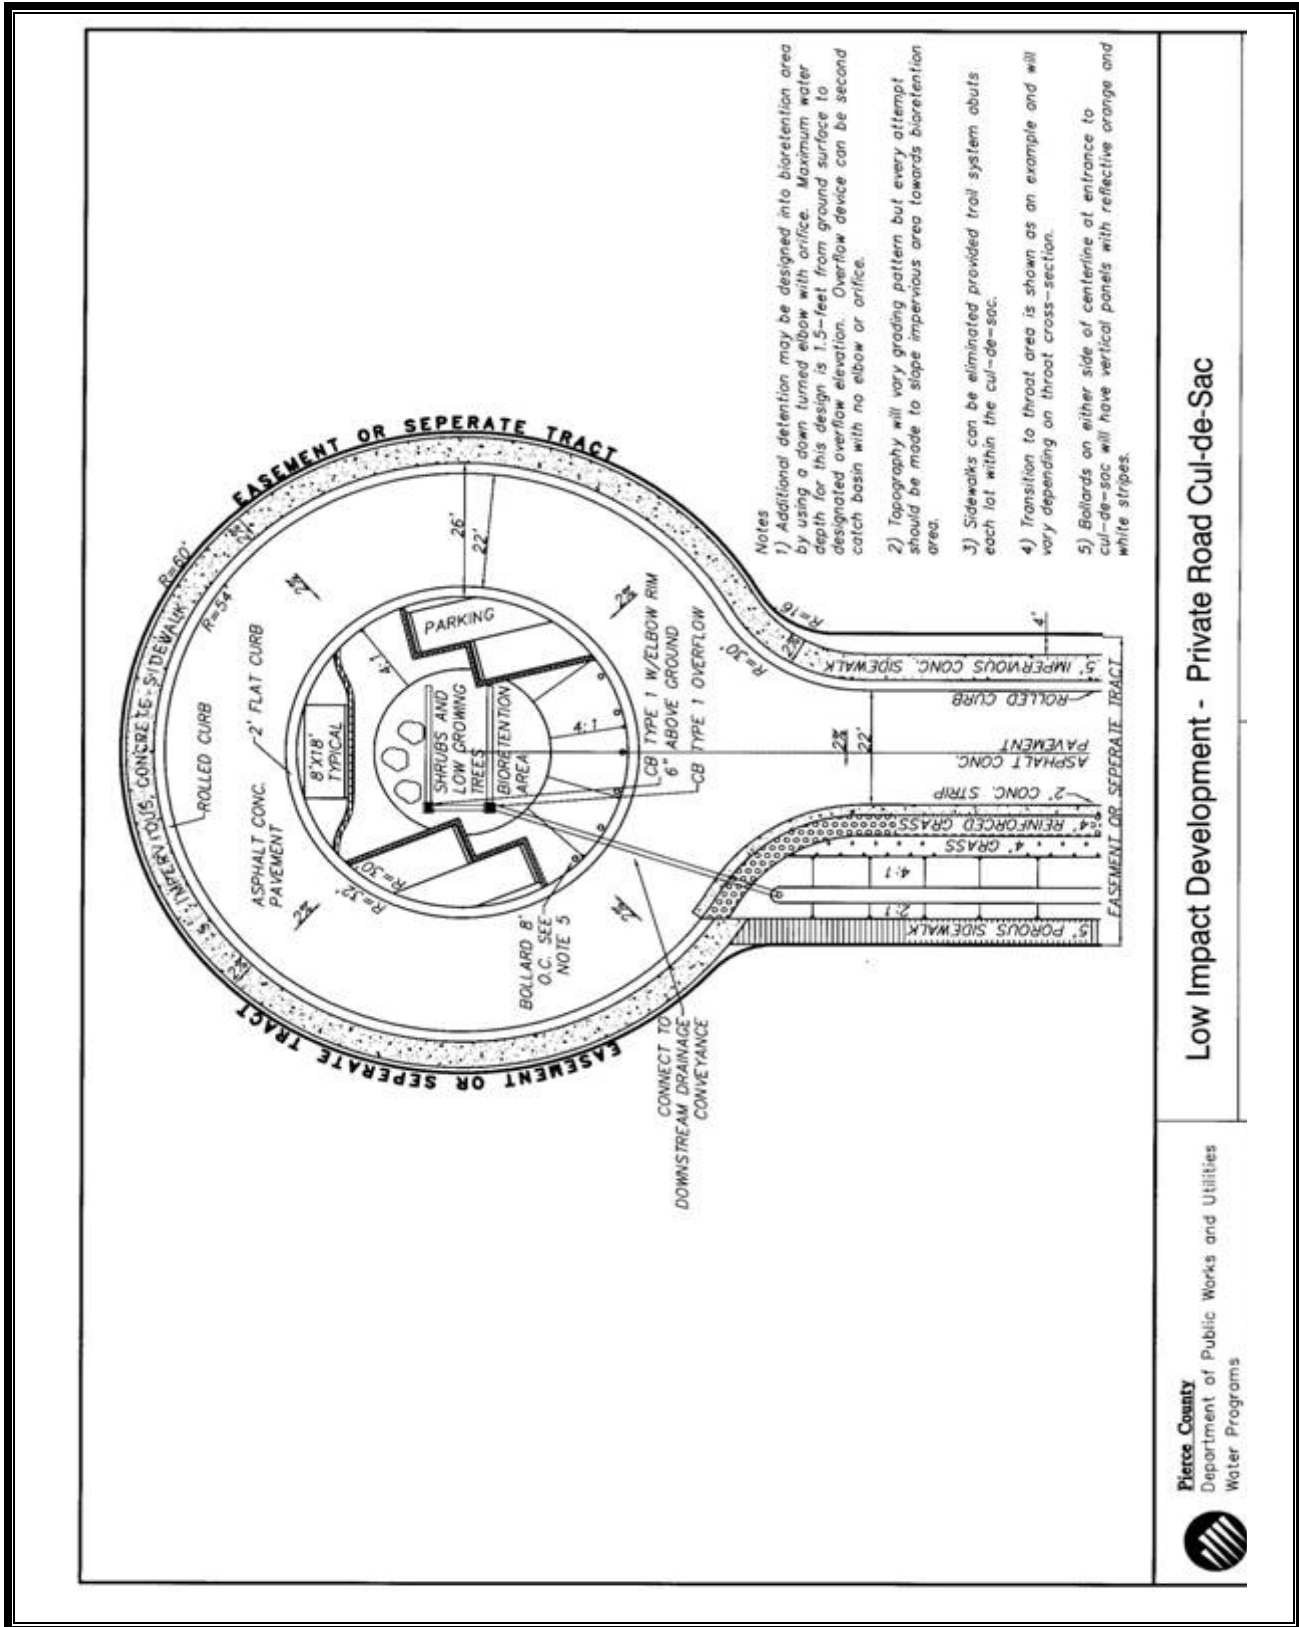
Local Road Cul-de-Sac Design with Bioretention.
